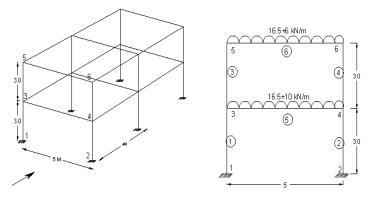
(a). Typical Steel structure (b). Typical Steel Frame
